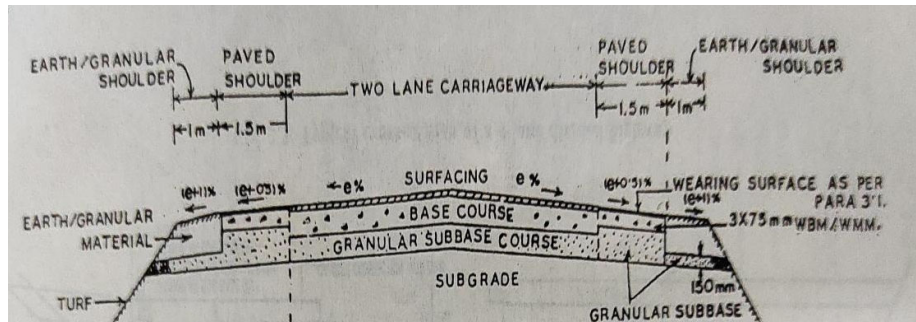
P(c) Typical Cross section of a 2-lane State Highway
